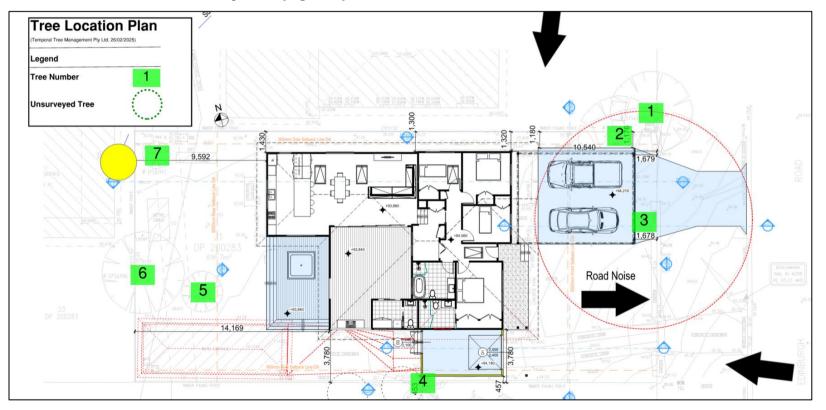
Site Plan, prepared by *Rapid Plans* (Project No: RP0919CER, Drawing No: DA1004, Revision: -, drawn 19/12/2024). Annotated by Temporal Tree Management Pty Ltd. (26/02/2025).
